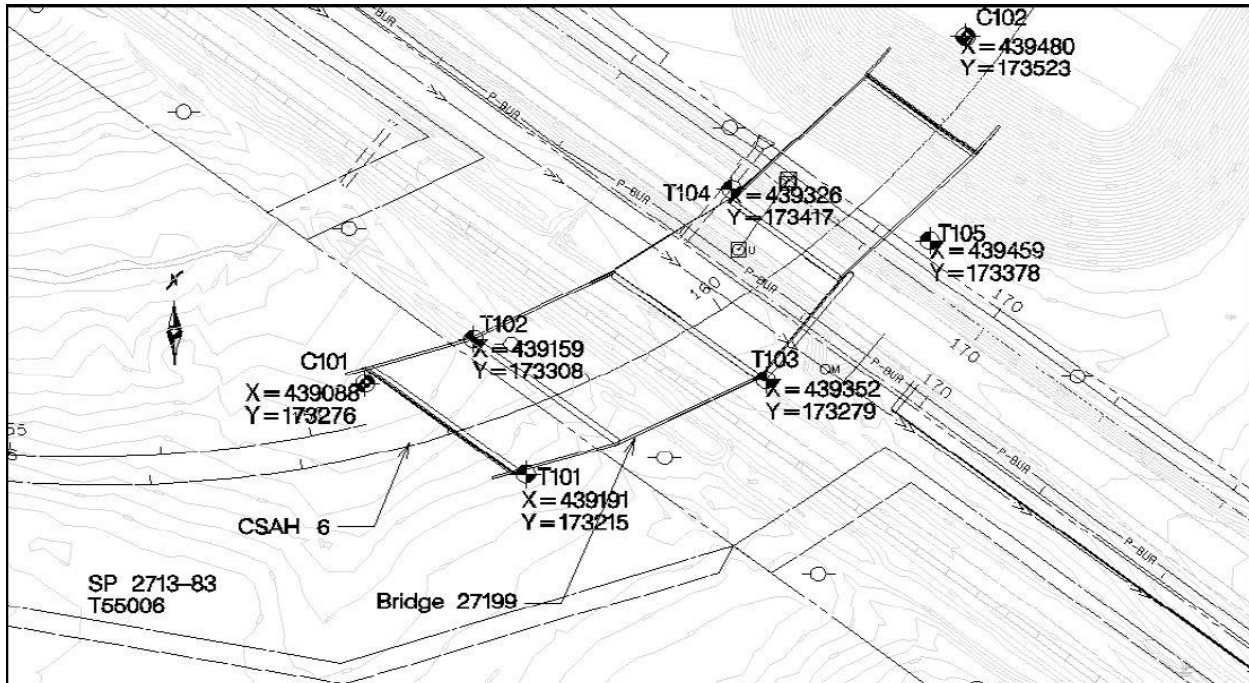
Site plan showing locations of borings and in situ test soundings (MnDOT, 2013).
